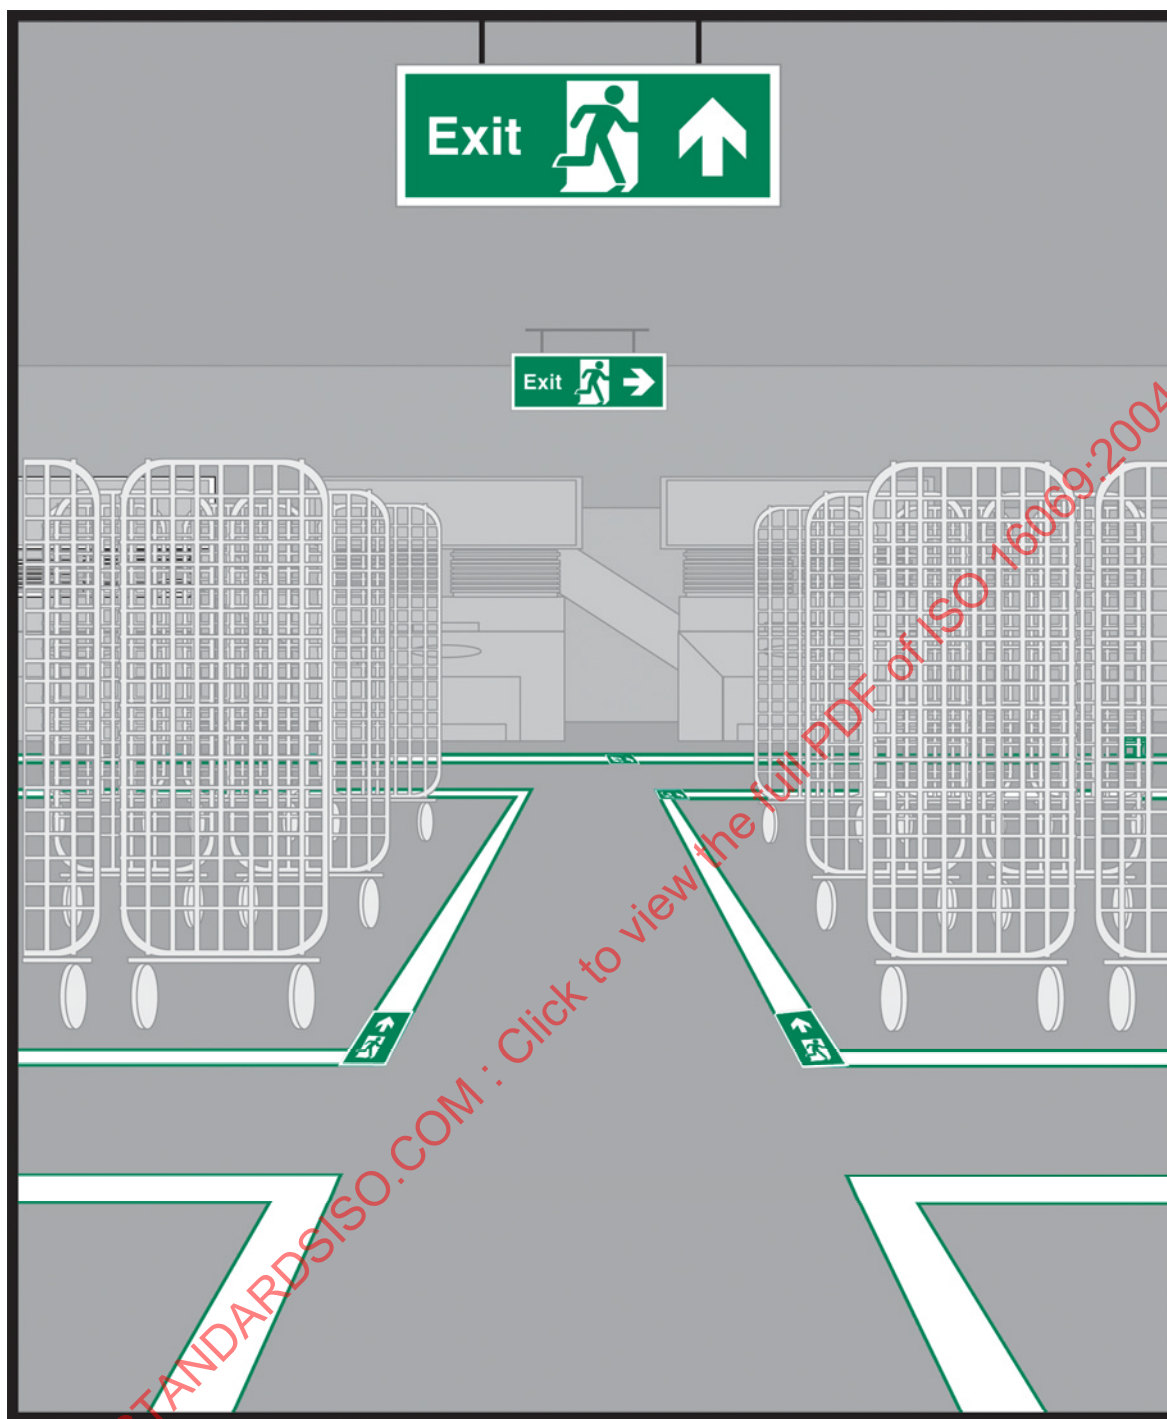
Example layout of an intersection with a wall-mounted guidance line
